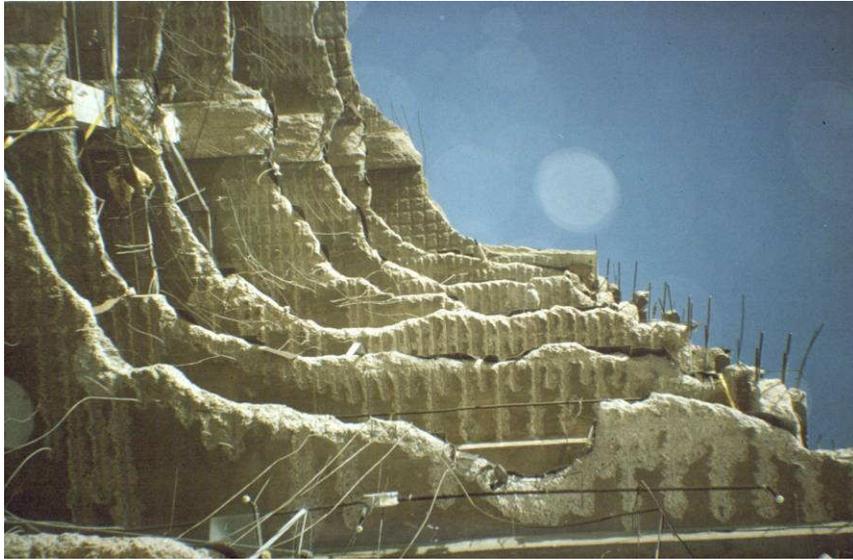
Murrah Building Floor Slabs (looking up) Missing Slab-Reinforcing Steel
